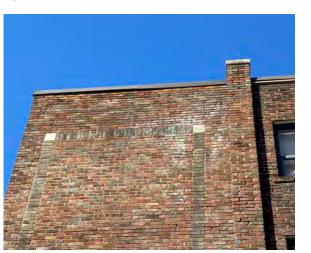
Condition of masonry, south façade. Note efflorescence, recessed and missing mortar joints.
